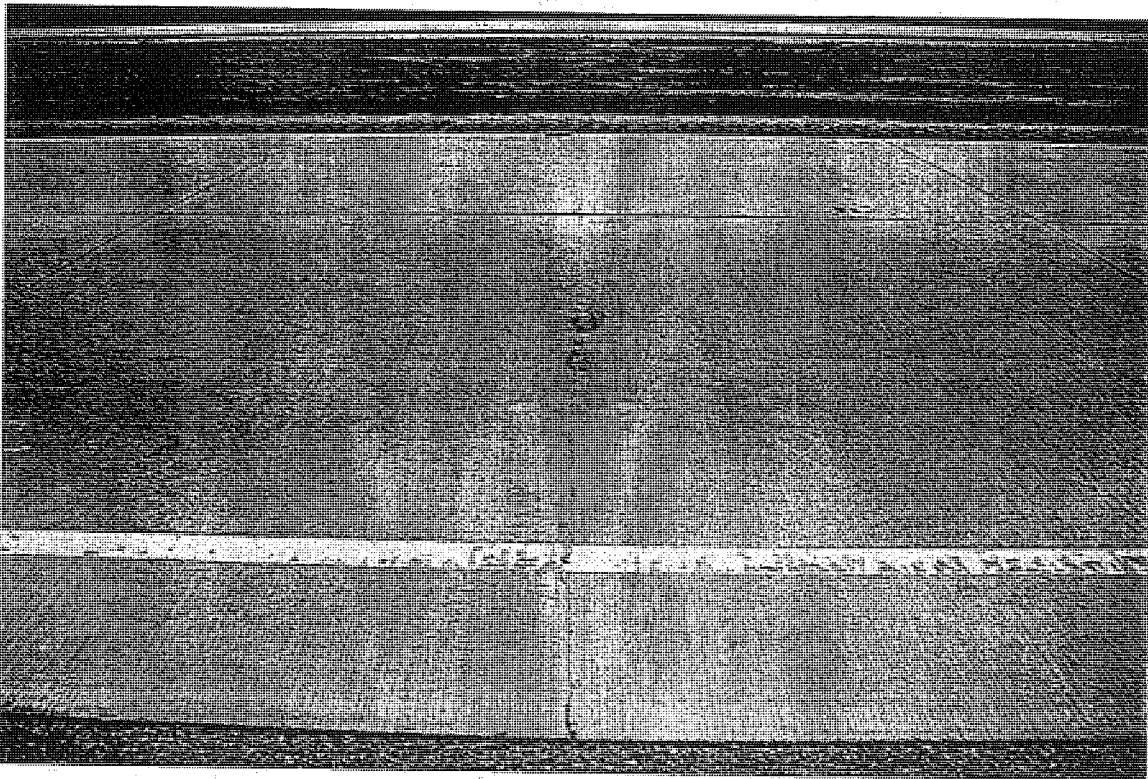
A transverse crack at midslab in CSN# 11017-32516A (Section C), EB. Moderate spalling is present.
